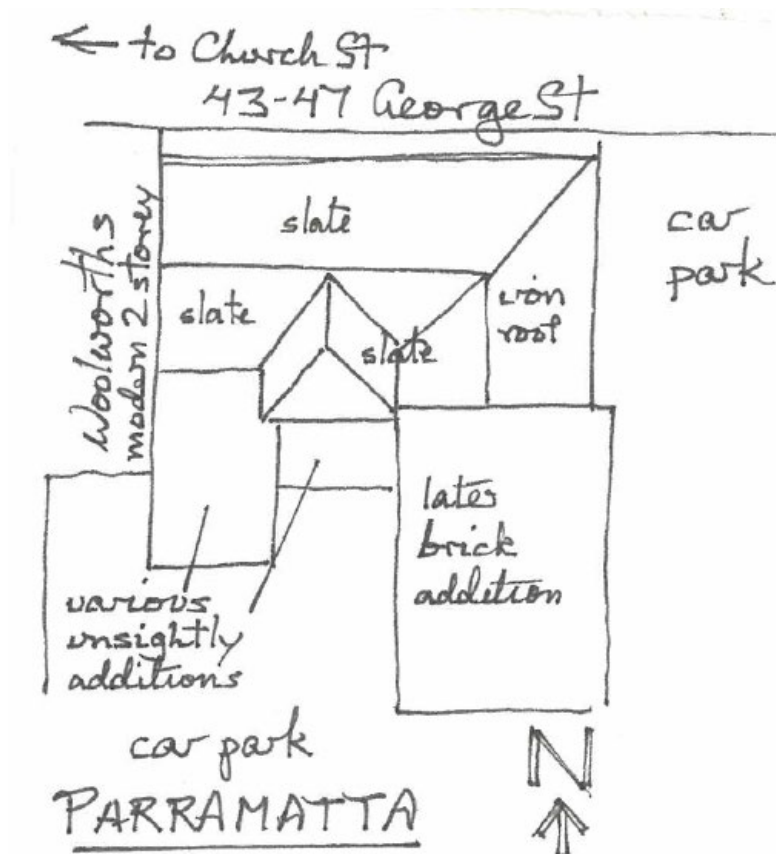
Sketch site / roof plan of George Street Shops c.1984, depicting various rear additions and the adjacent car park to east boundary. Source: National Trust Listing Card, accessed June 2022.
